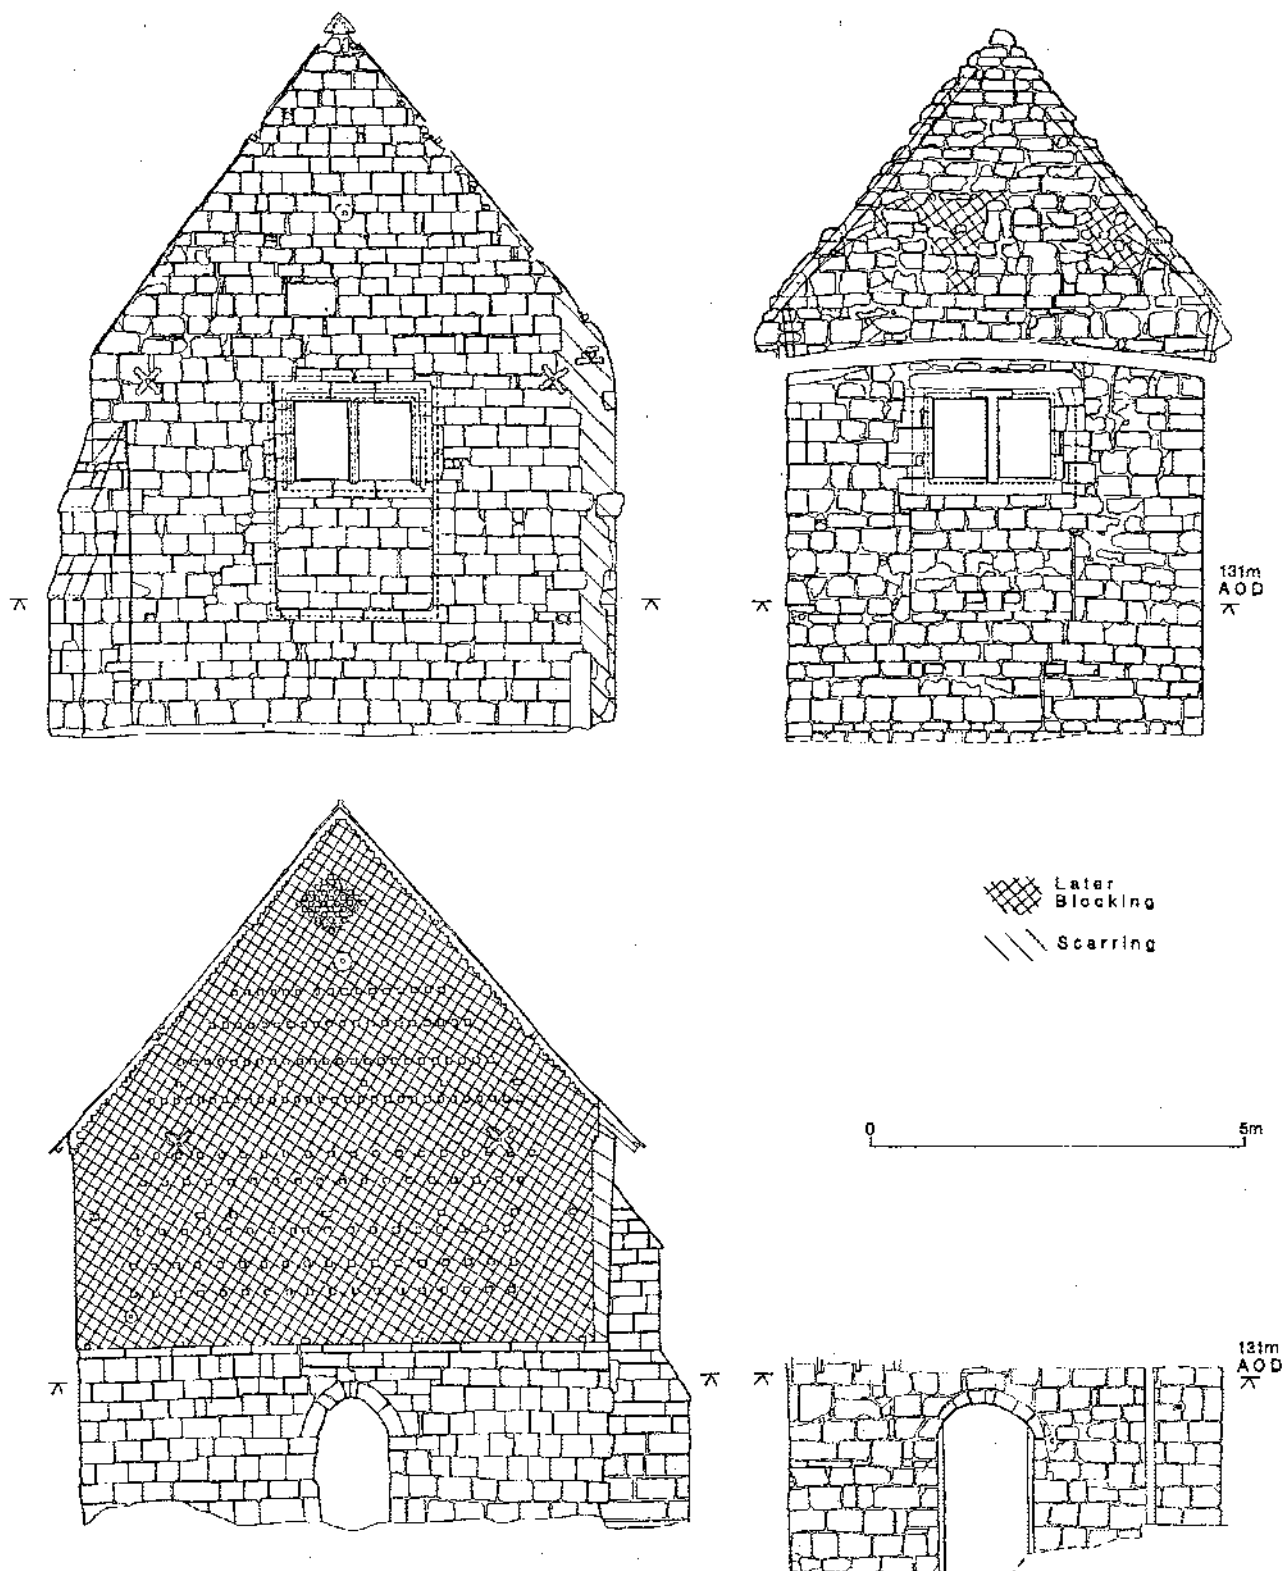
Structure 1, external and internal elevations of west and east walls.
